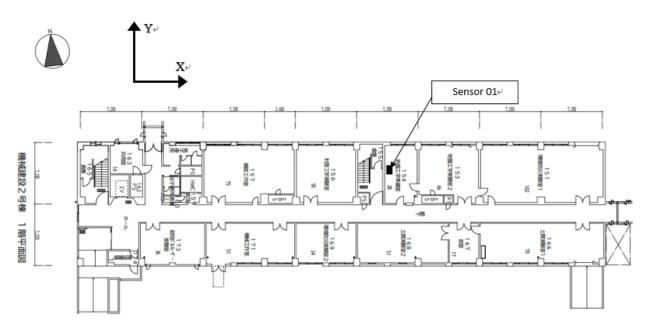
Location of sensor 01 installation on the first floor of the RC building
